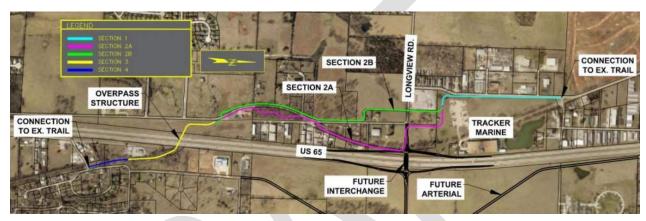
Preferred Crossing and Alternative Section 2 Trail Alignments
